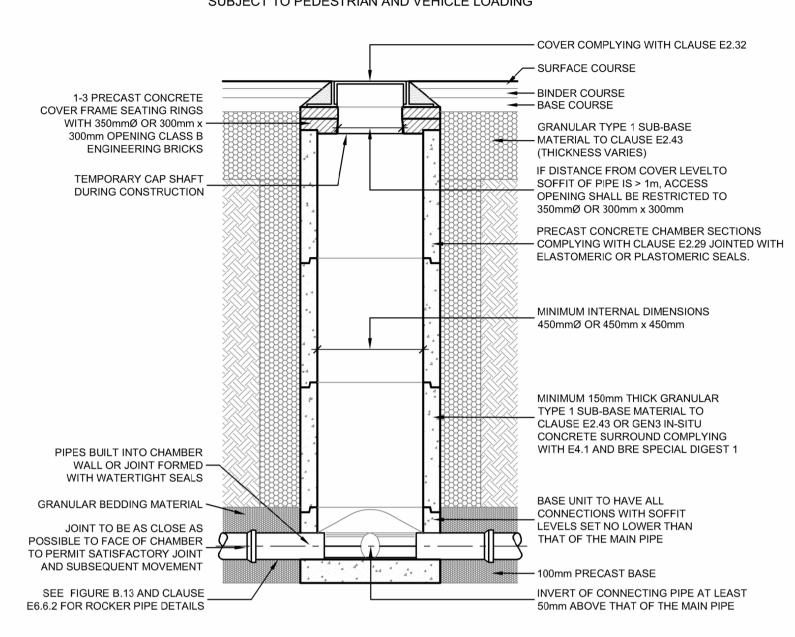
TYPICAL INSPECTION CHAMBER DETAIL - TYPE D DEPTH FROM COVER LEVEL TO SOFFIT UP TO 3m FLEXIBLE MATERIAL CONSTRUCTION FOR USE IN AREAS SUBJECT TO VEHICLE LOADING
